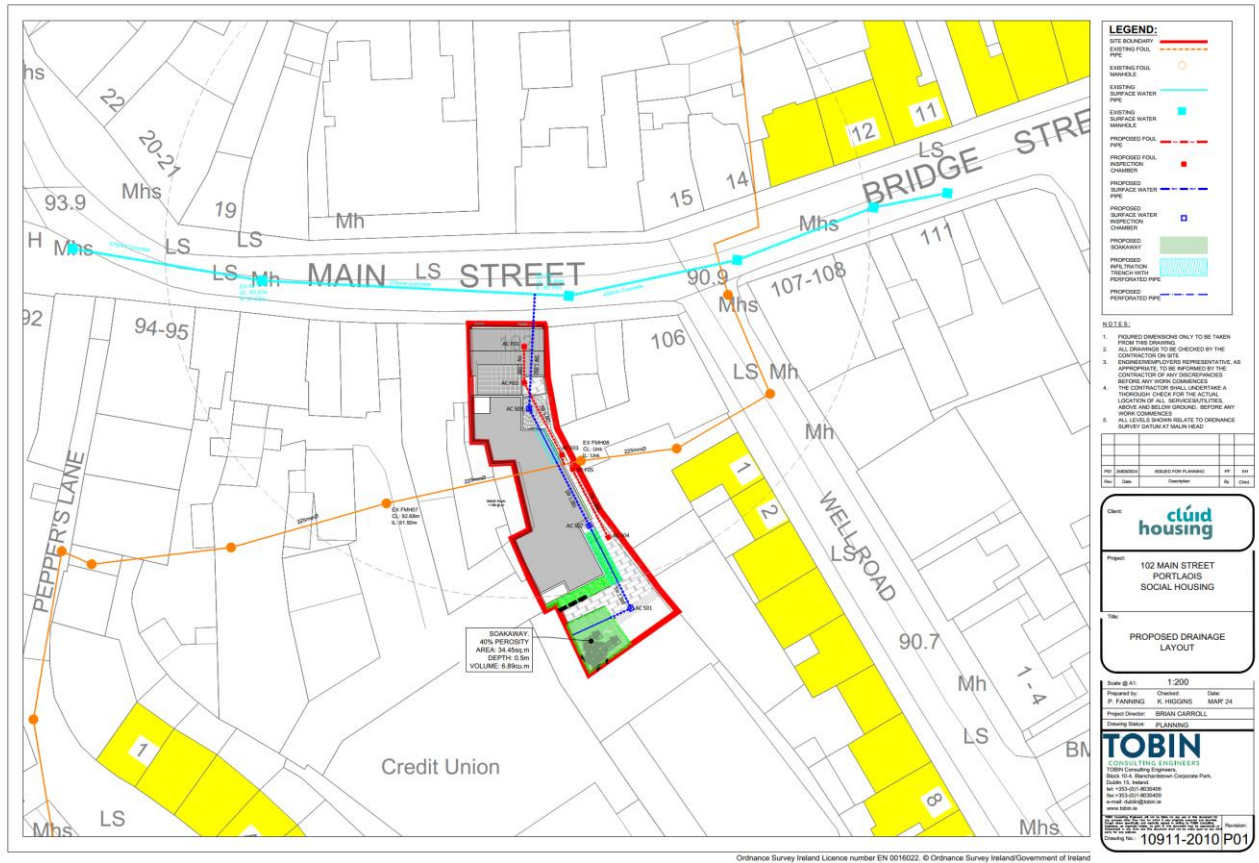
Proposed Drainage Layout, drawing 10911-2010
